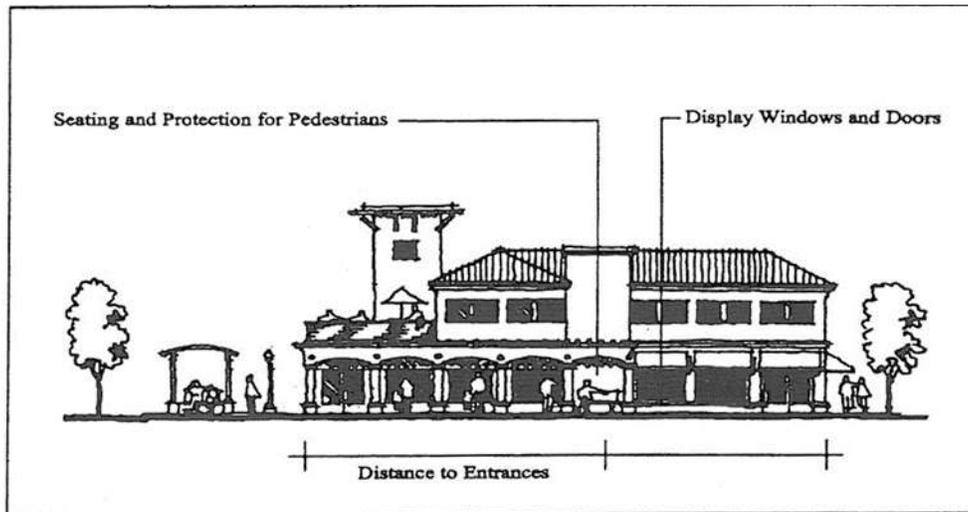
B(1) - Commercial Building Design Elements (Typical)
